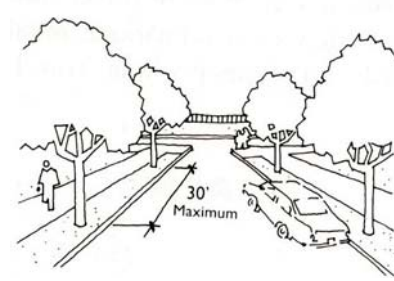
Street Width. Width of a typical street. (Calthorpe 1993, 96).
